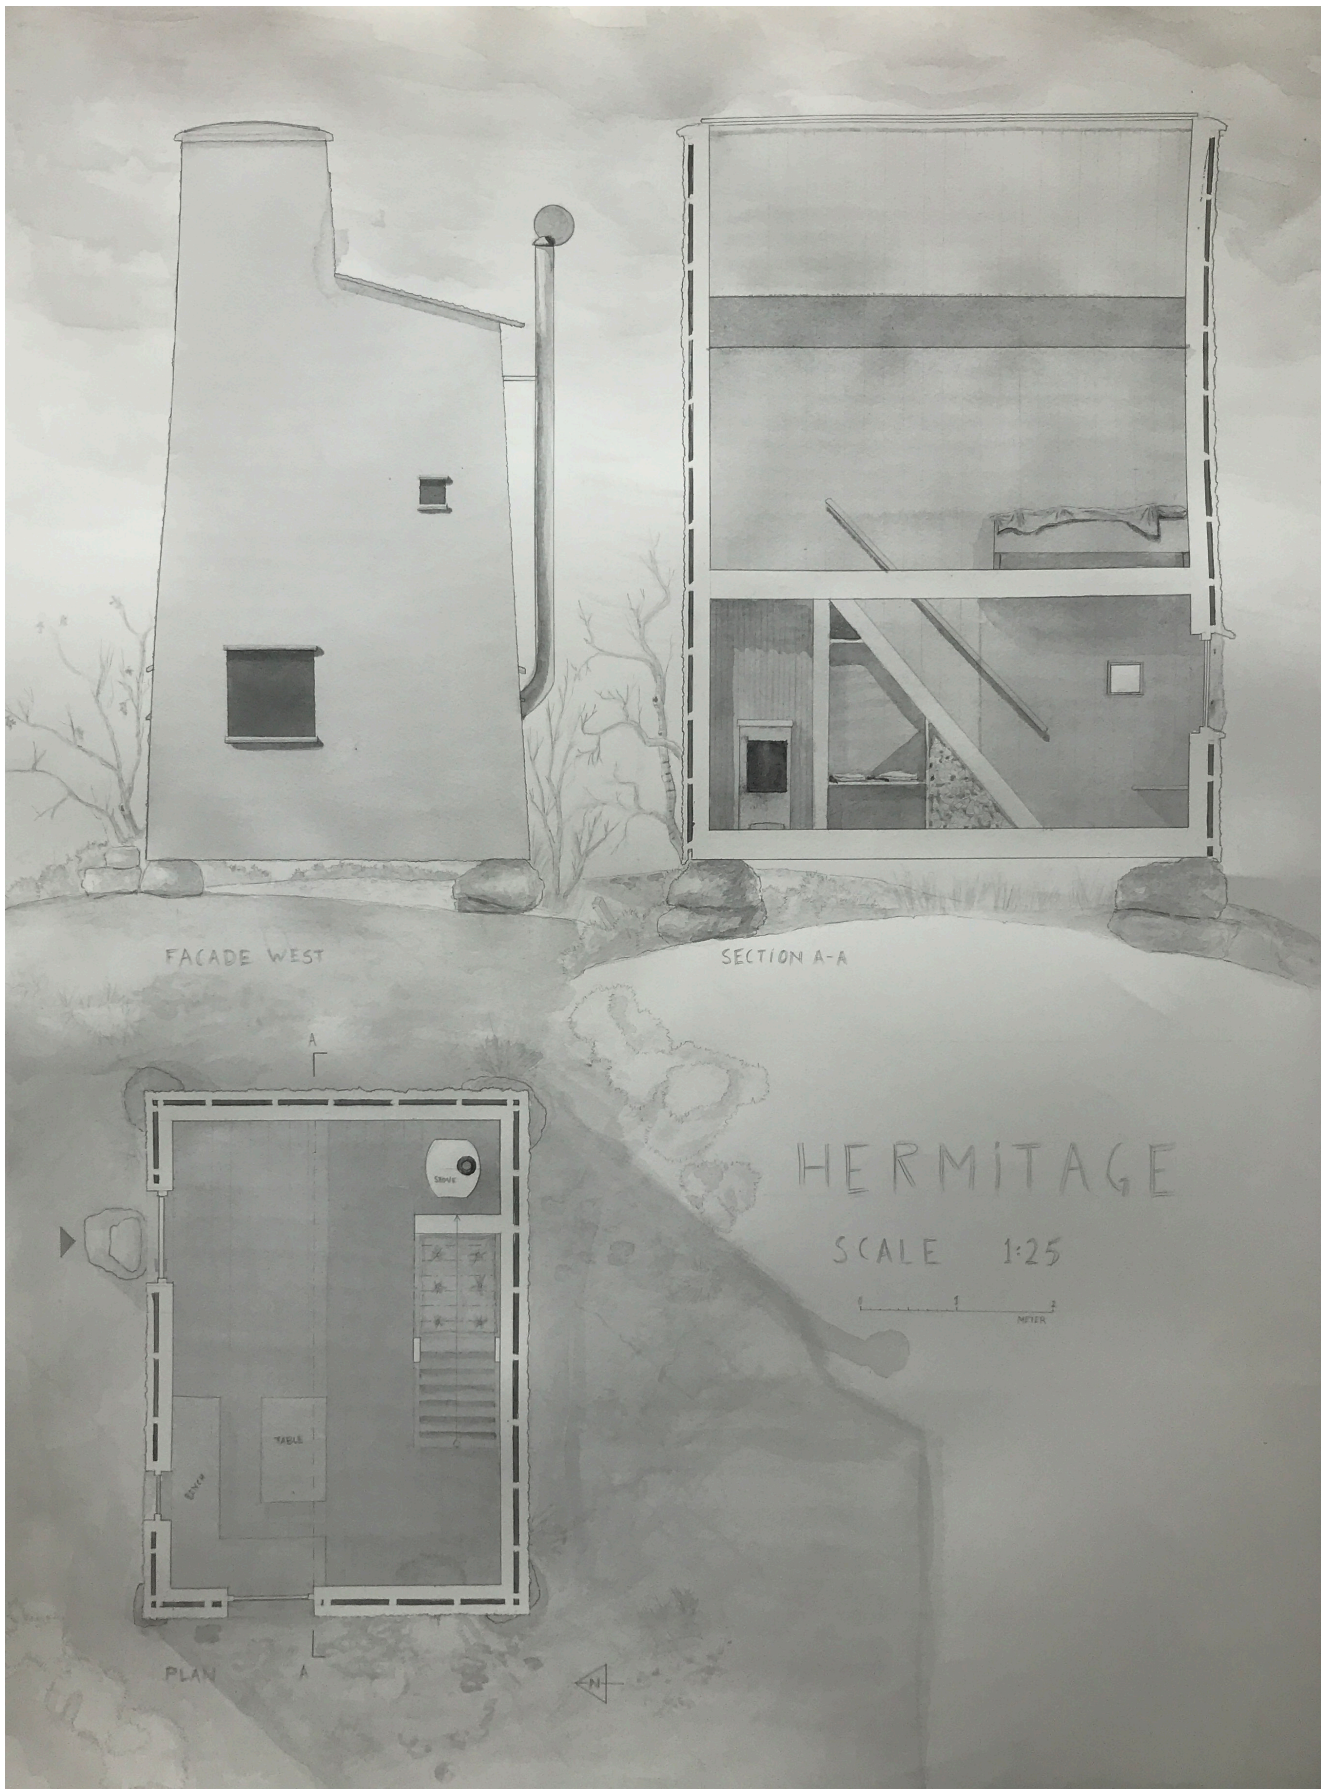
Final proposal, facade, plan and section, watercolor paper satin 300g. (Own photo)
